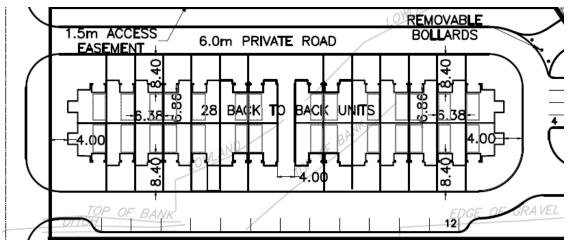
Proposed Back to Back Townhouse Units within the Preliminary Site Plan, prepared by IBI Group
